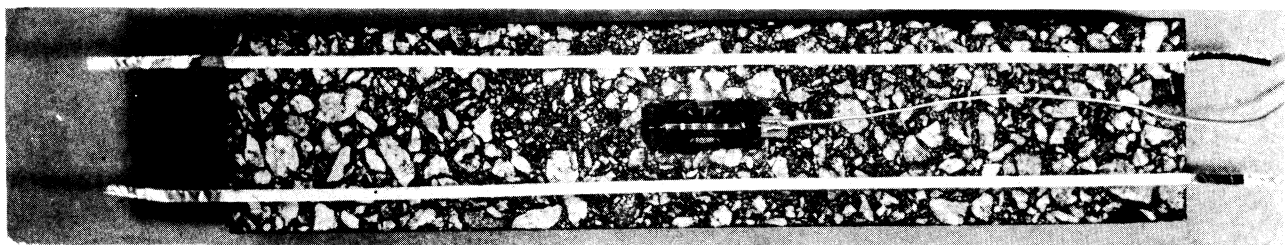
Fatigue specimen with strain gage and aluminum foil strips.
